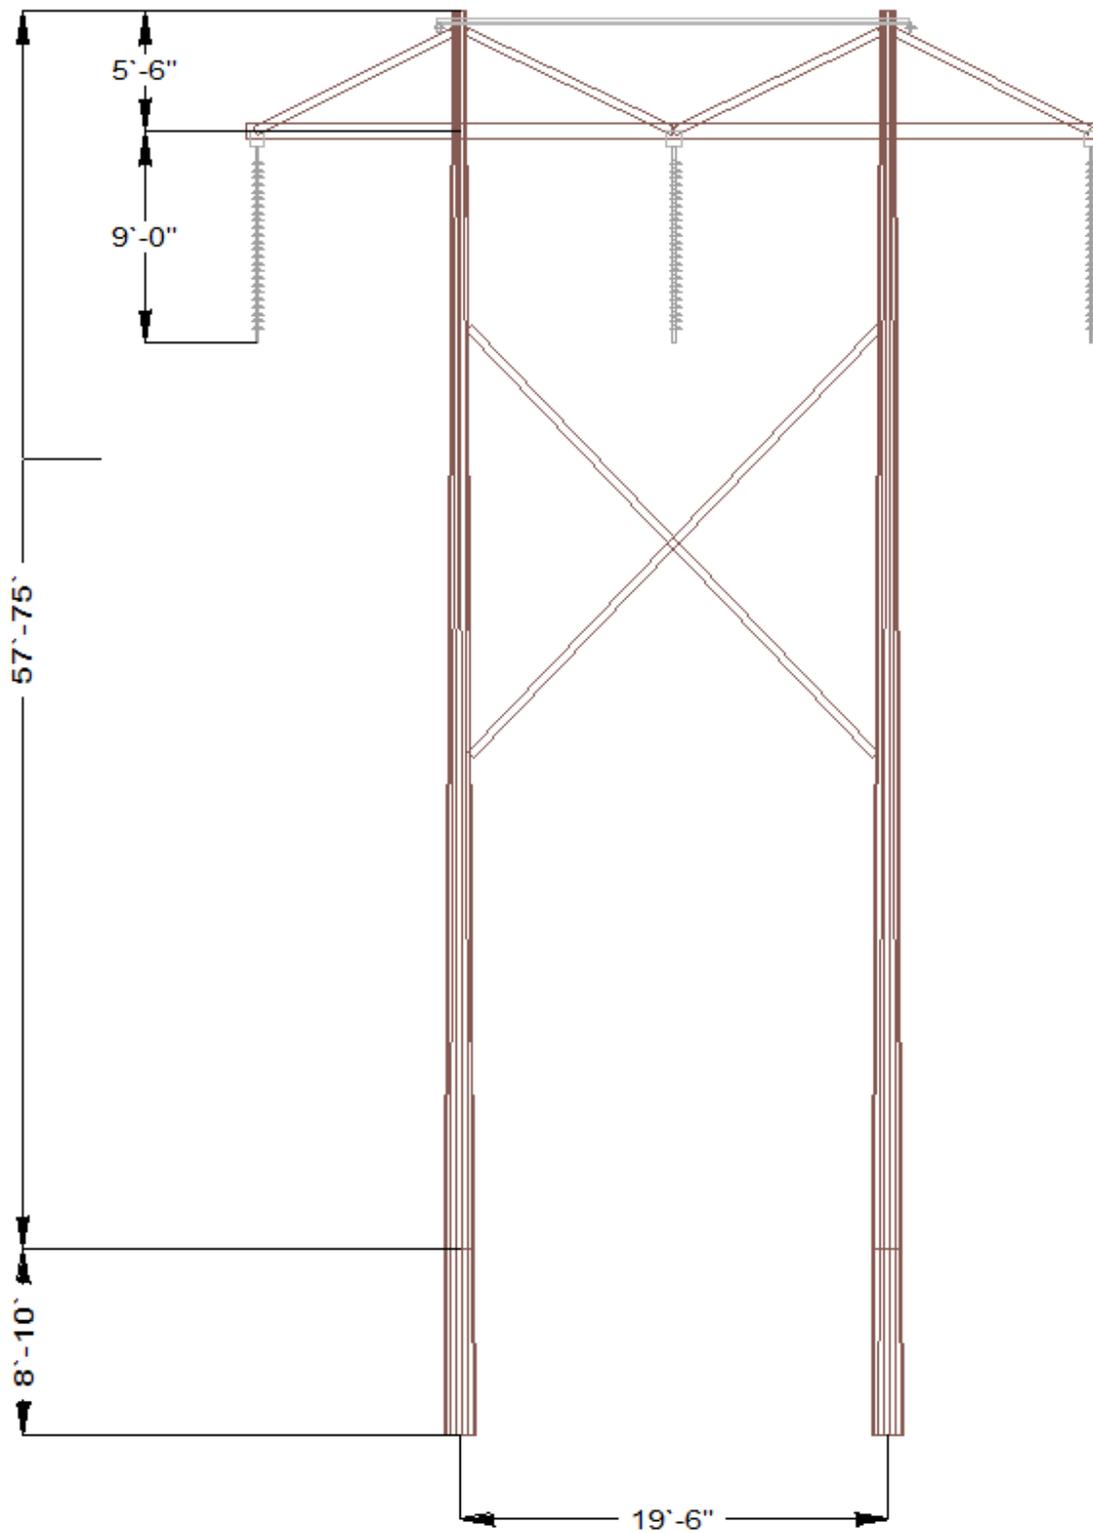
Proposed Route Rebuild Single-Circuit 230-kV Steel H-Frame Structure
